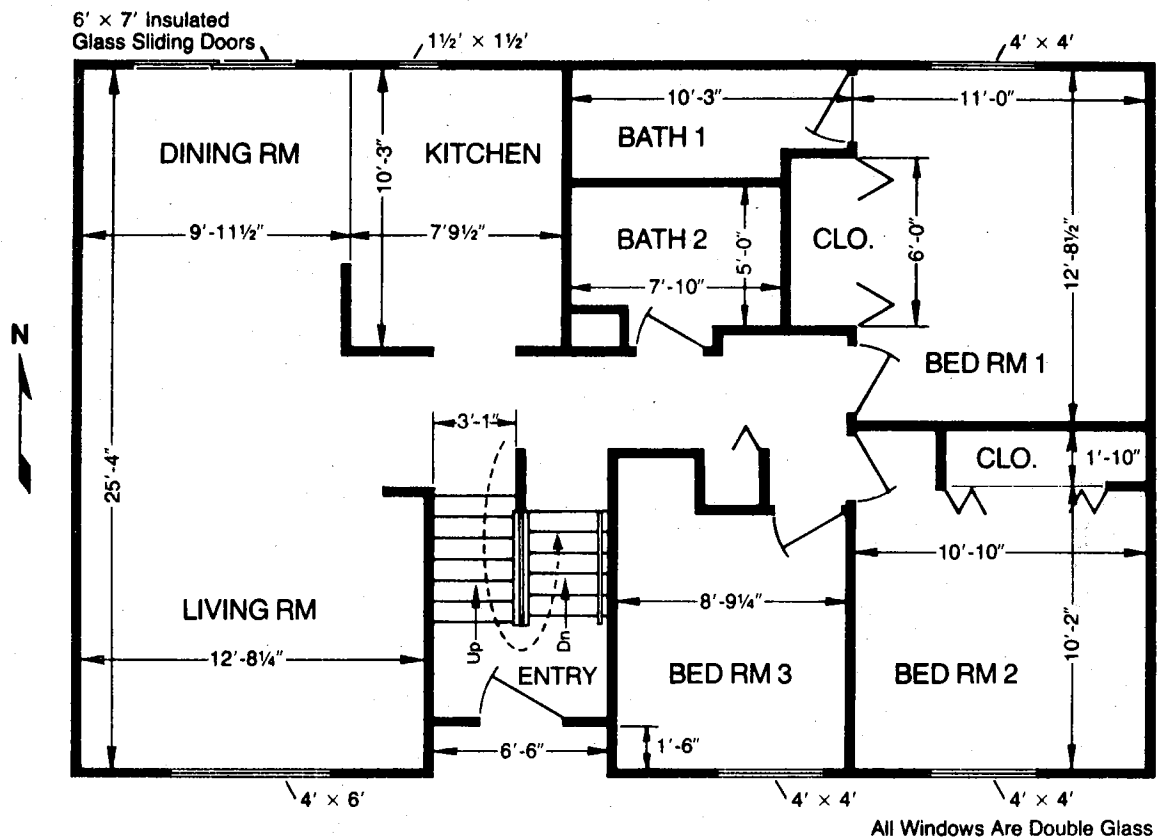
First Floor Plan for Residence of Example 7.4.
